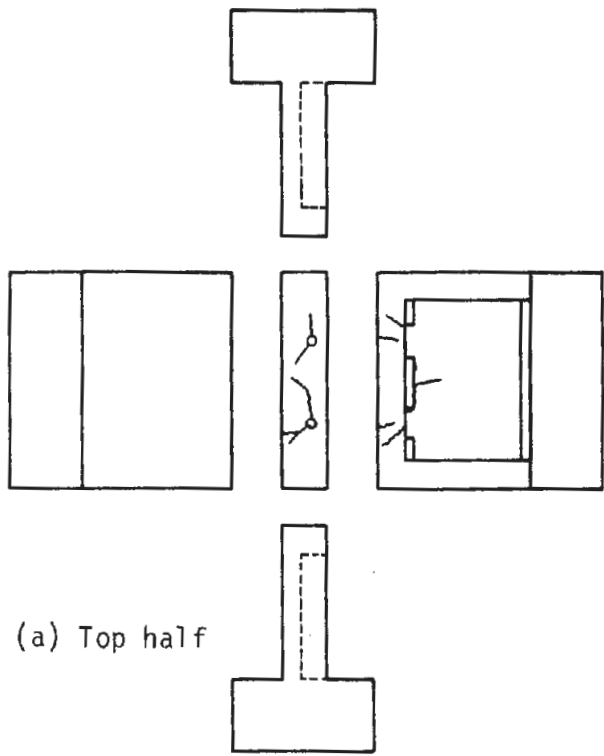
CRACKING OF SPECIMEN J-5 AFTER TEST
